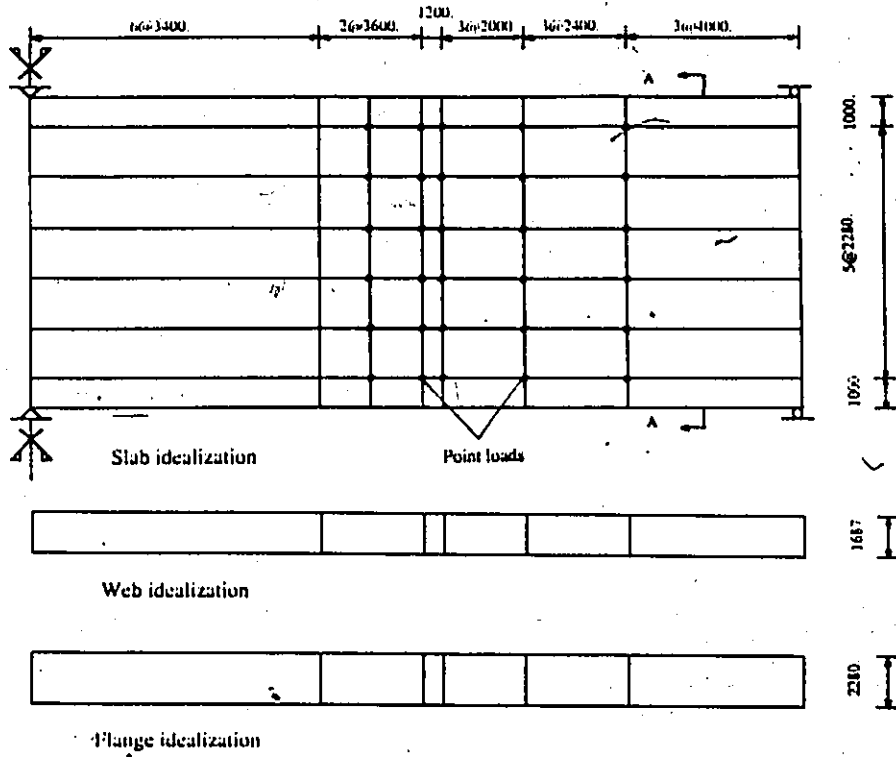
Finite Element Idealization of the S.S. Box Girder Bridge
